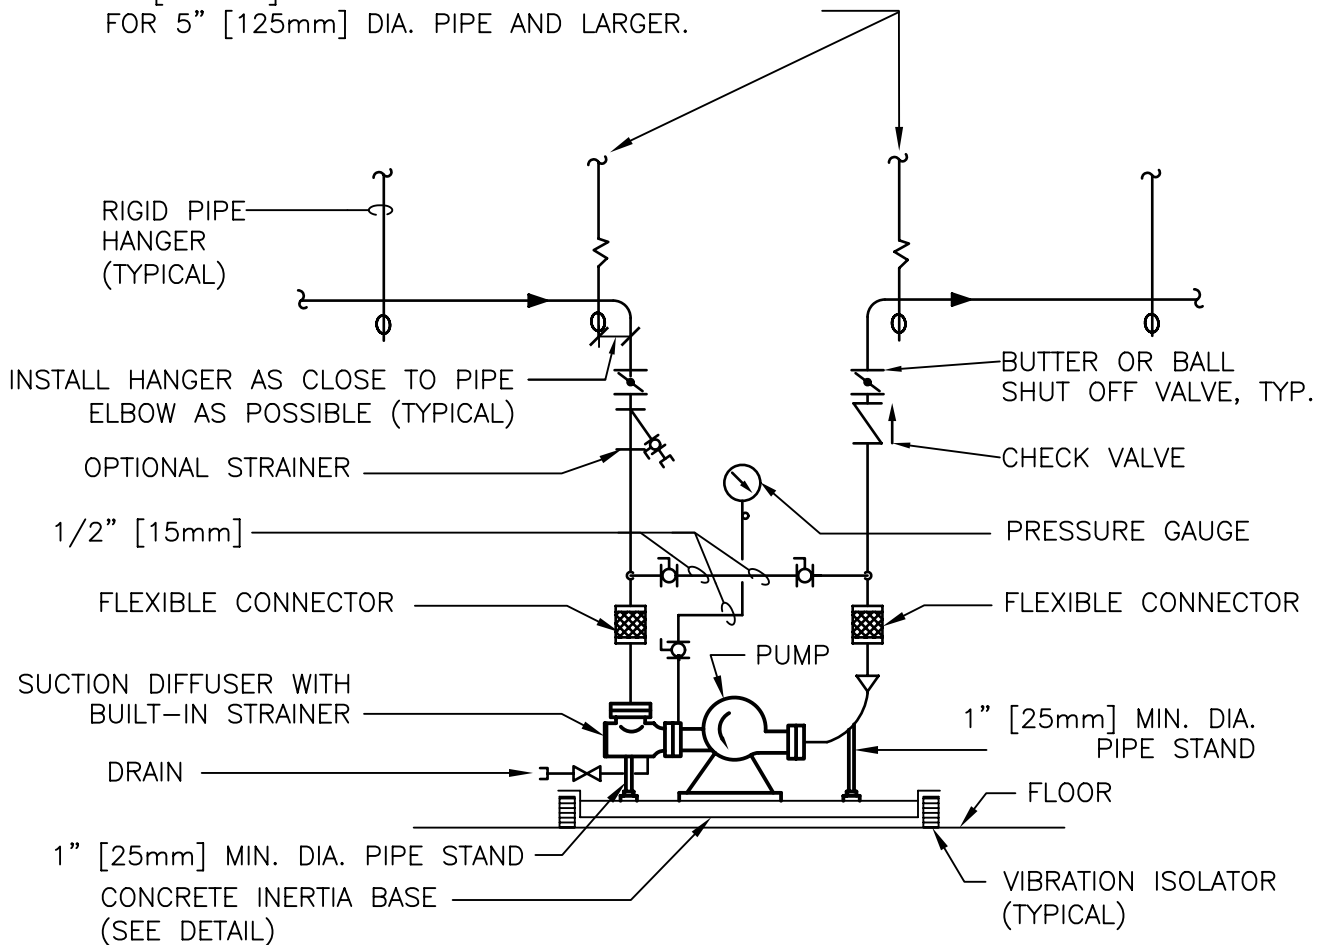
DETAIL TITLE / SINGLE SUCTION FLOOR-MOUNTED PUMPS - CONNECTIONS WITH MECHANICAL COUPLINGS
